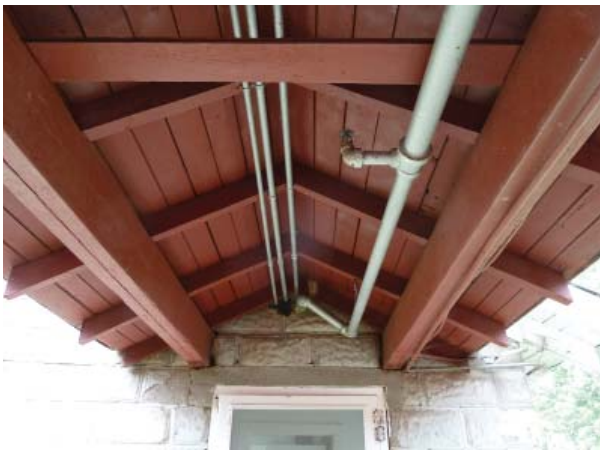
Milk House: Connector between Milk House and Goat Barn. Electrical conduit at ridge and fire suppression piping adjacent.
